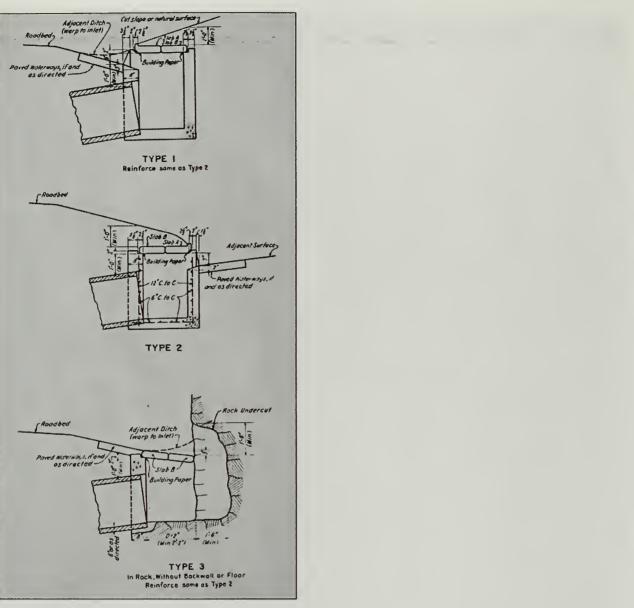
Three types of curb type drop-inlets from West Street Extension project and Schooner Head Road project. (U.S. Department of Commerce, Bureau of Public Roads, Project 6A5, Sheet 9 of 24, July 1952 and Project 22A1, Sheet 8 of 12, May 1957)
